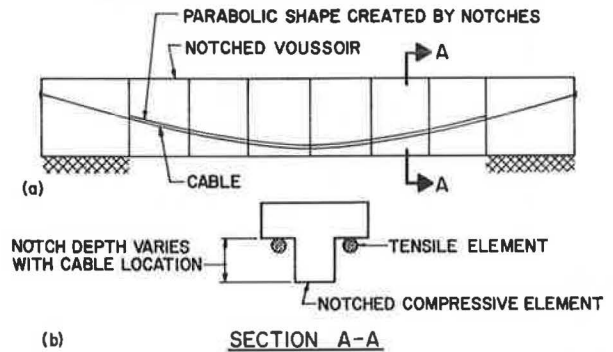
Typical Tension Arch structure in elevation (a) and section (b).
